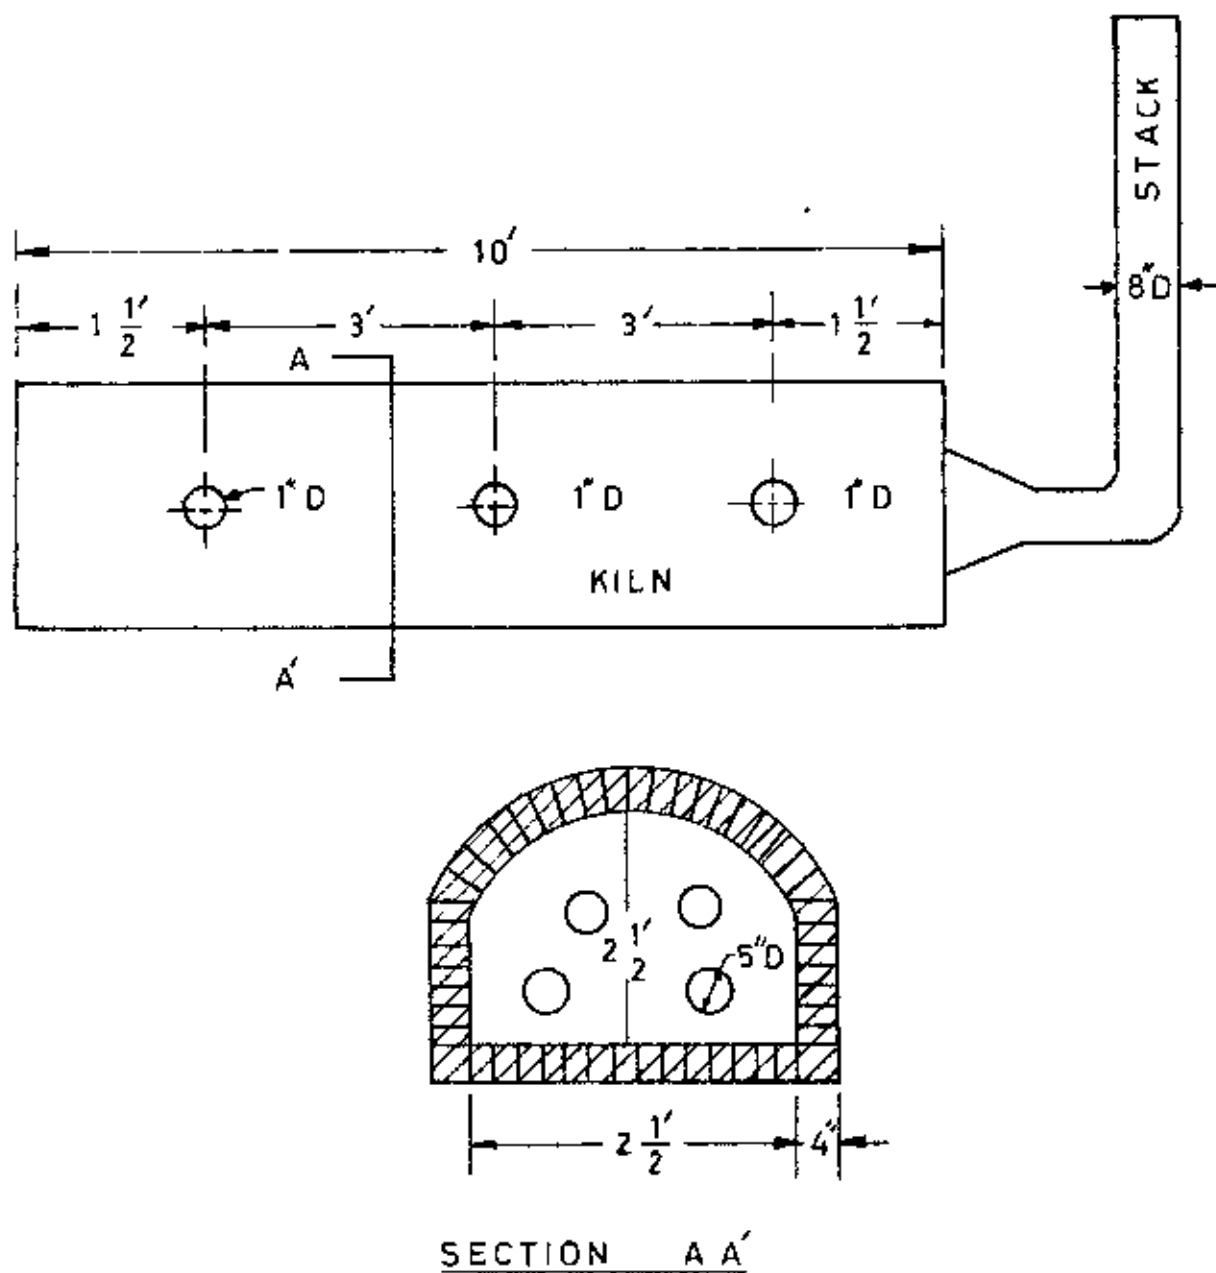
'6 EXPERIMENTAL KILN WITH DIMENSIONS
